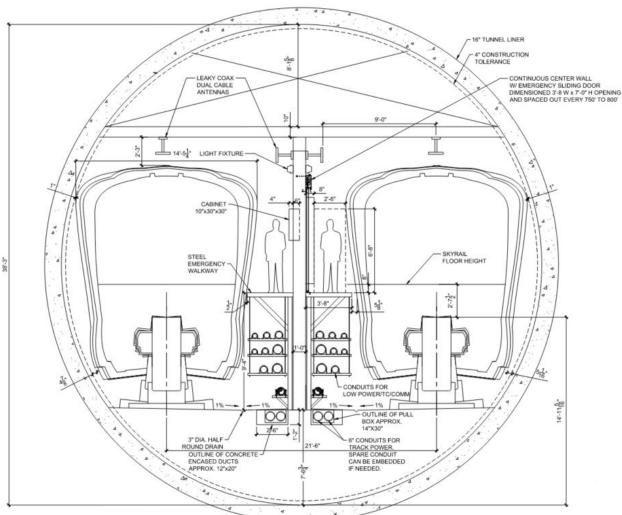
Typical Underground Monorail Guideway Cross-Section
